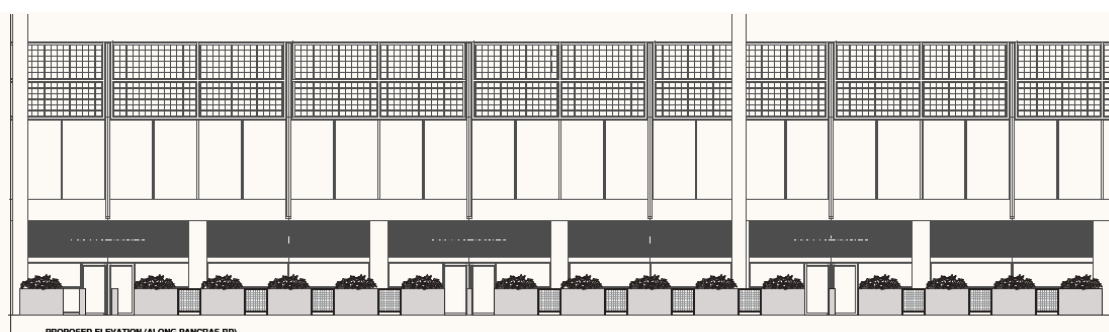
Elevation of proposed planters, screens illustrating bollards at entry/exit points
